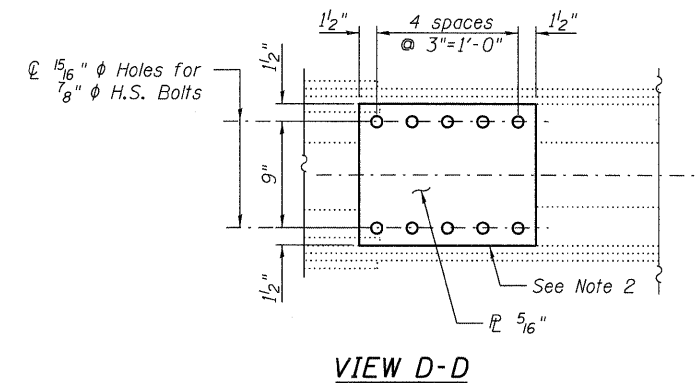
STAY PLATE AT PANEL POINT
